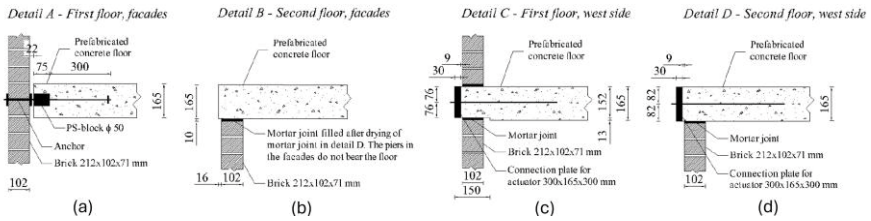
Construction detail of the connection between concrete floors and walls [5]
